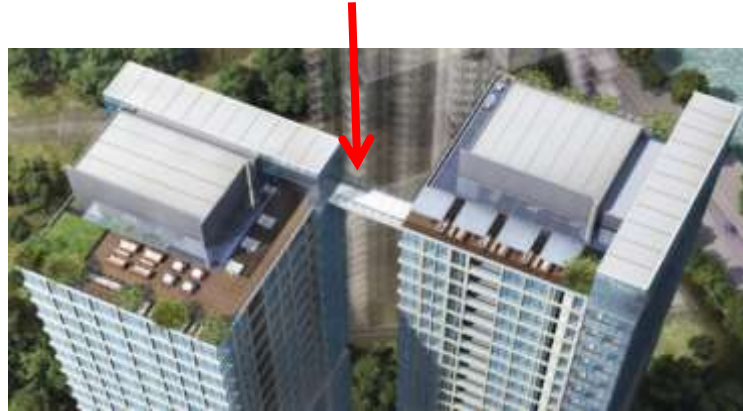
Proposed fifty storied twin towers located in Colombo, Sri Lanka and the skybridge connected at the rooftop.
